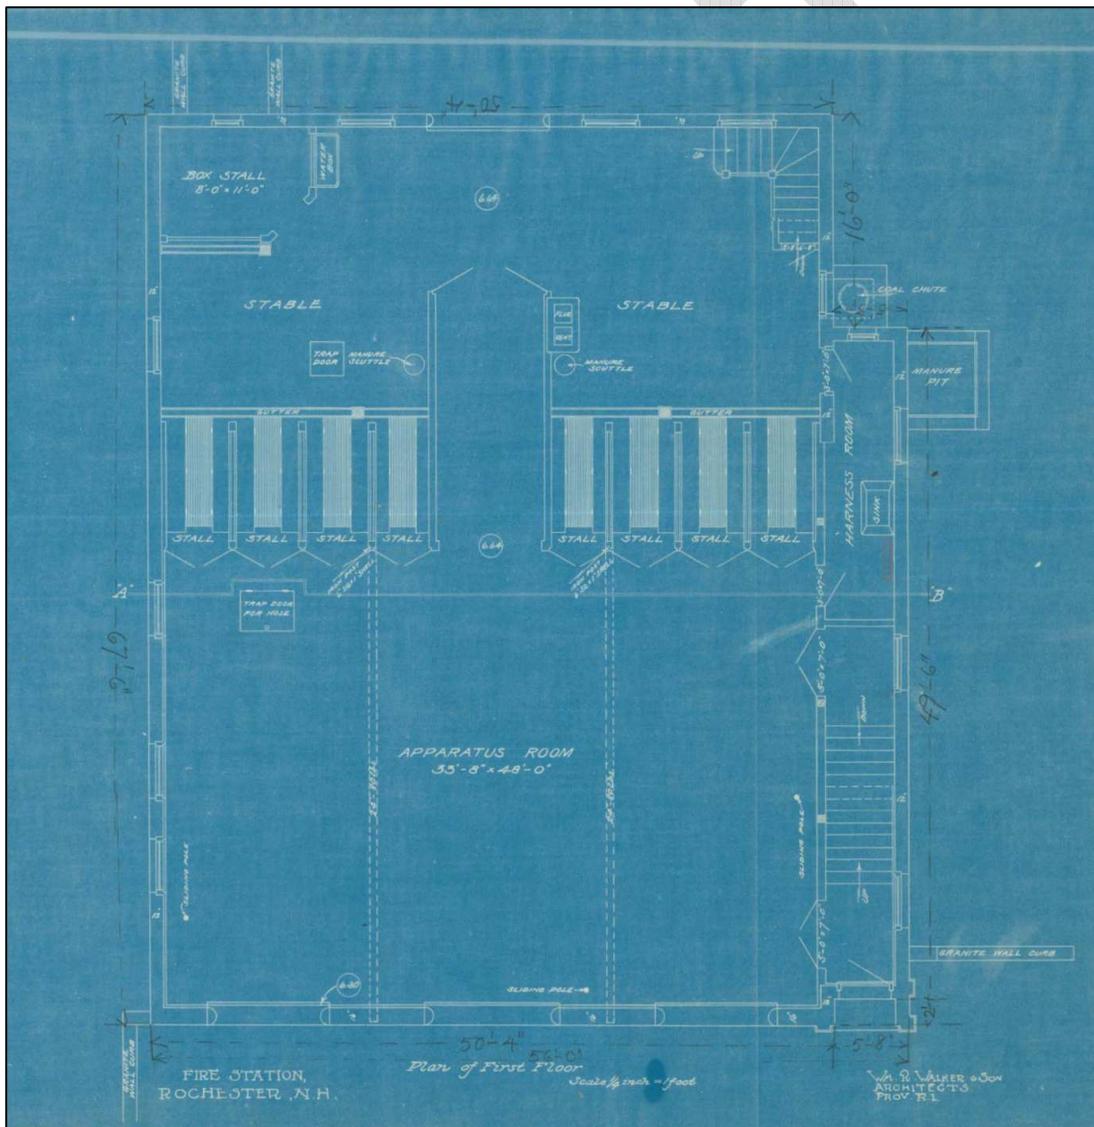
Walker & Sons plan of 1st Floor, 1903.
